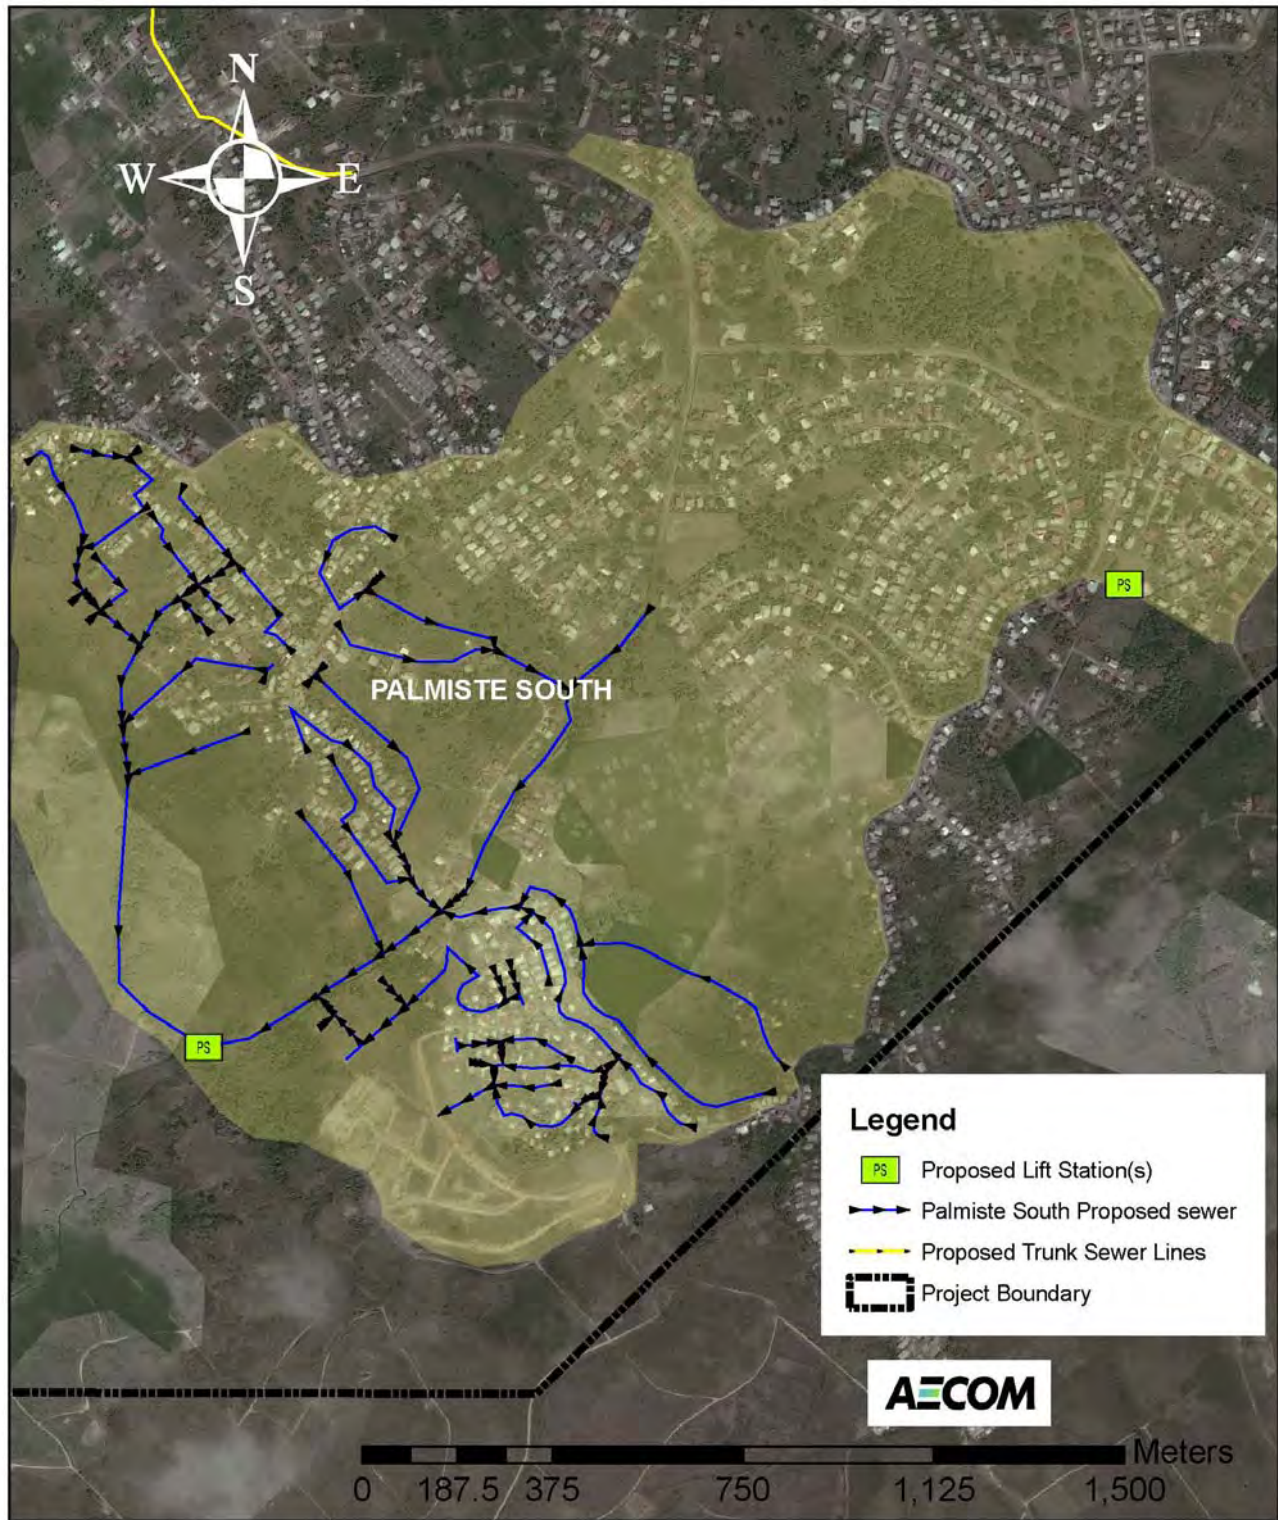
Palmiste South Subcatchment New Sewer Layout
